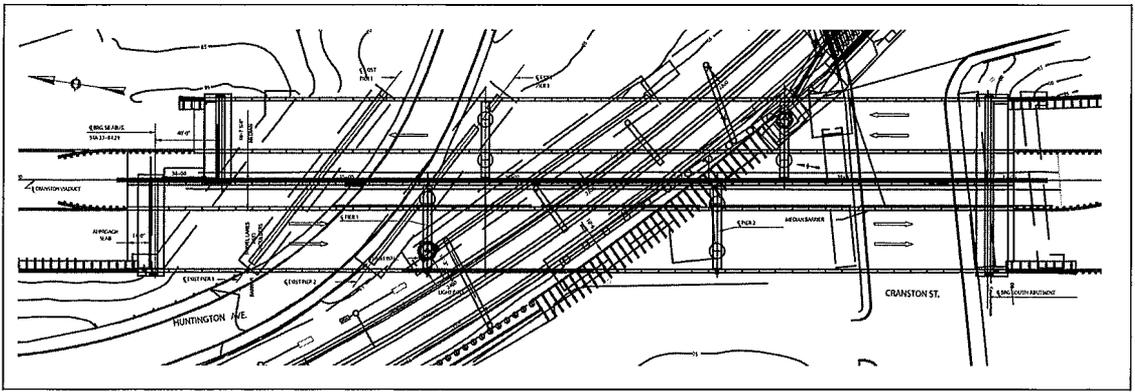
Plan for the new viaducts layout (old viaduct piers and abutments shown underneath).
